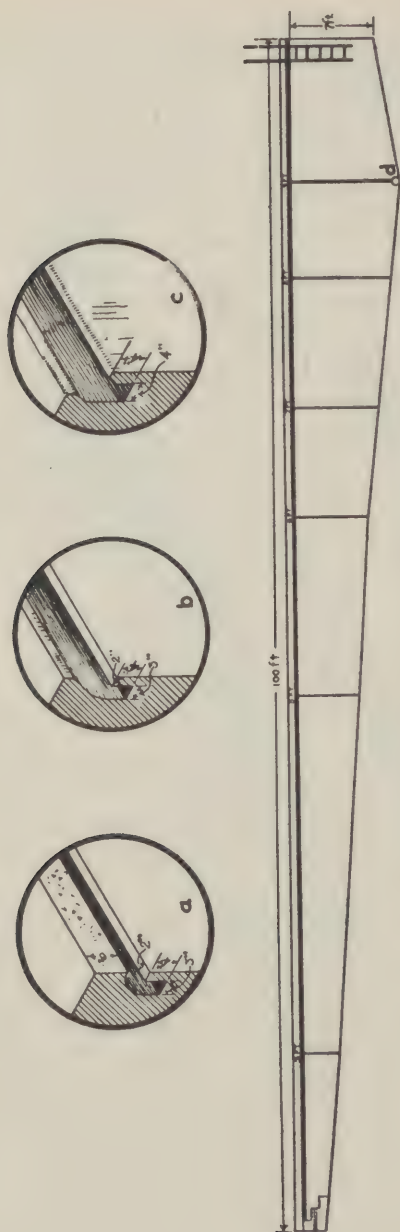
Plan of side wall of a swimming pool showing slope of floor and depth. a, b, c—Different types of scum gutters. d—Outlet drain.
